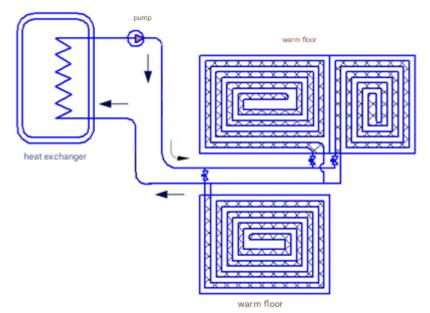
Schematic diagram of a heating system with warm floors in a typical rural house.
